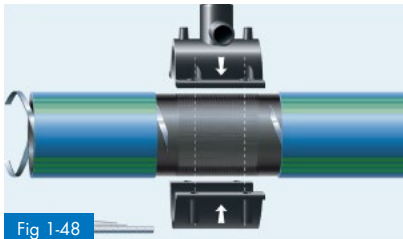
Mounting the tapping fitting according to the manufacturer's installation instructions
